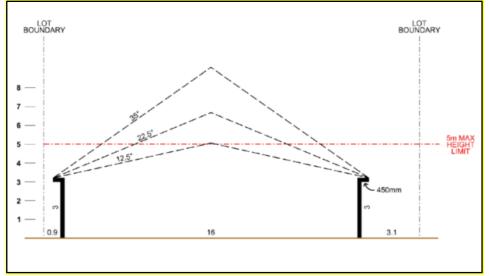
Five (5) metre maximum building height limit compared to roof pitches
